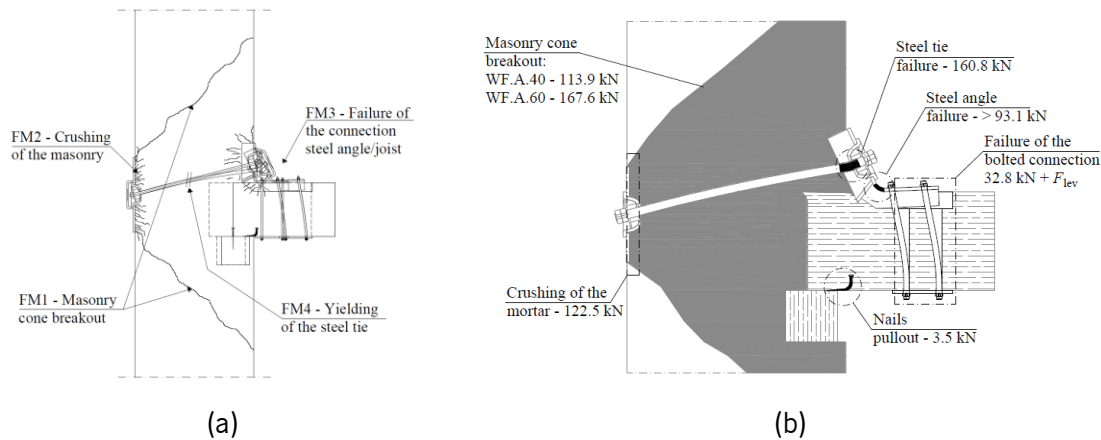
(a) Failure mode definition: FM1: Conical masonry breakout; FM2: Masonry crushing below the anchor plates; FM3: Yielding of the tie rod; FM4: Failure of the bolted connection between the steel angle and the timber joist; (b) estimated capacity of each failure mode. (Retrieved from Moreira (2015)).
